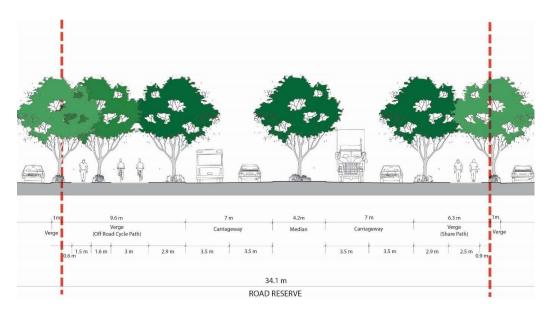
Sub-Arterial Road Cross Section (Off-Road Cycle Lane)
